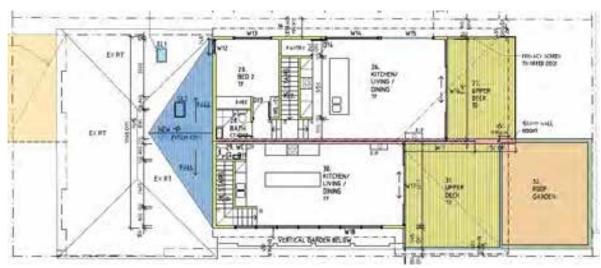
Proposed first floor plan (Source: Edifice Design, 2021)
